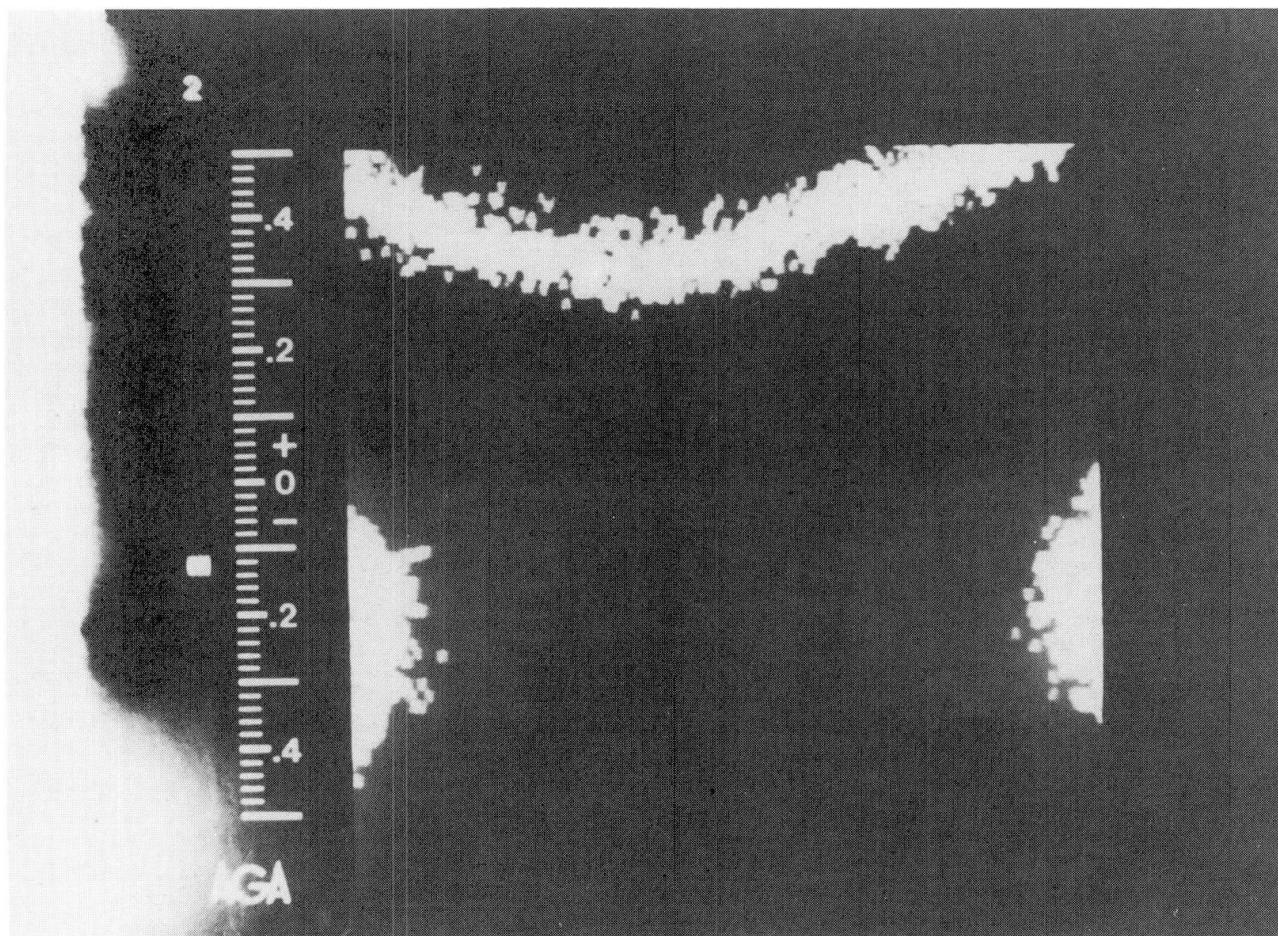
Thermo-visual inspection on a sheath enclosing a pre-heated prestressing tendon: the dark area at centre reveals a grou
